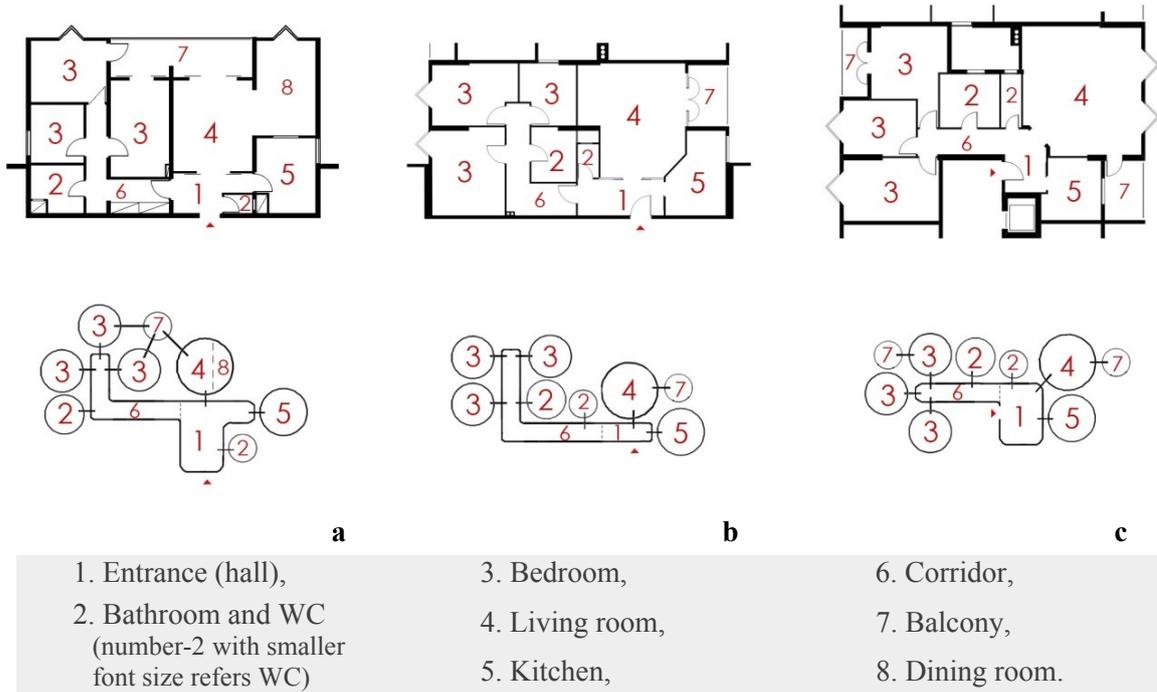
Units with 3+1 plan types in TIBAŞ Houses, Karabağlar, Izmir, 1988-1990: a. Above: unit with A-type plan, Below: plan diagram of unit-A; b. Above: unit with B-type plan, Below: plan diagram of unit-B; c. Above: unit with C-type plan, Below: plan diagram of unit-C (Source: Archive of Karabağlar Municipality [plan schemes and diagrams were drawn by İpek Ek])
